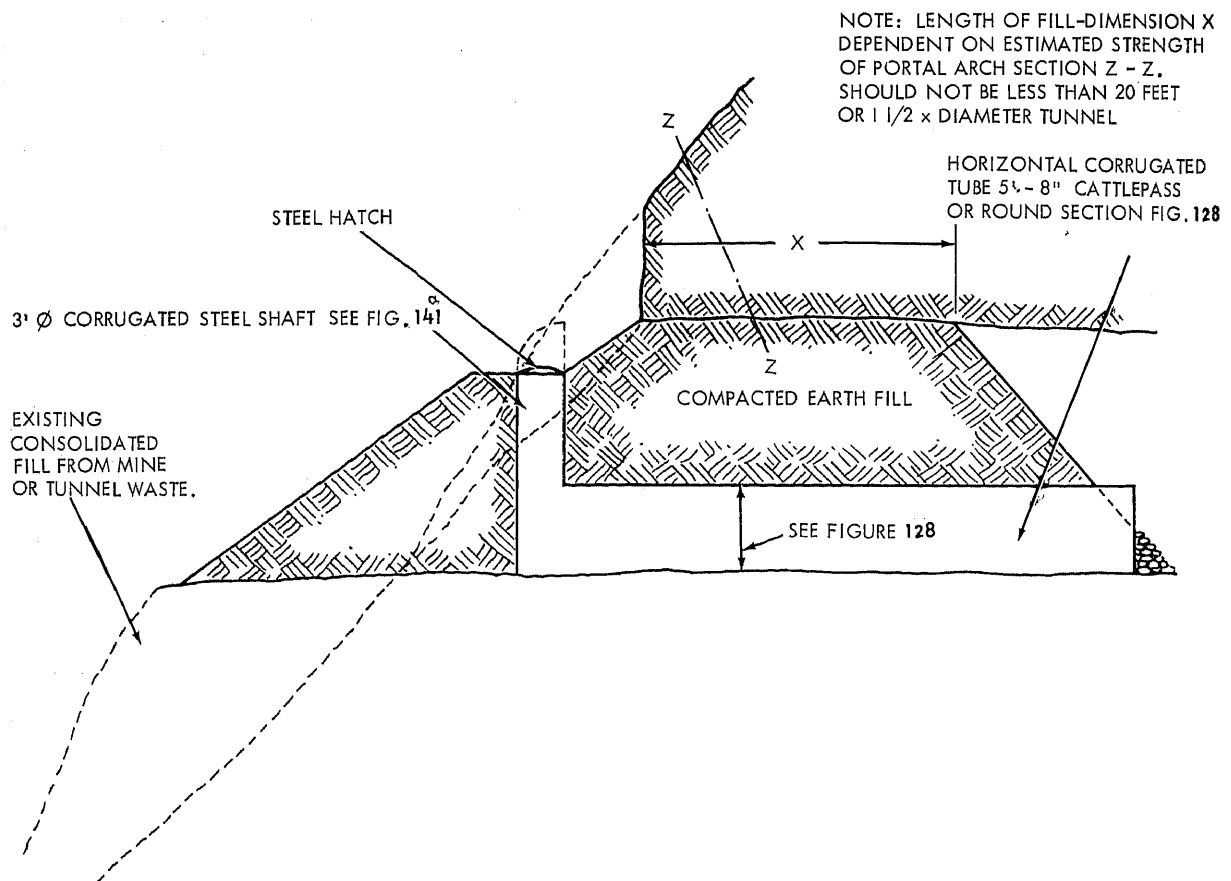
Combination vertical and horizontal culvert entry for mine, tunnel, or cave.
